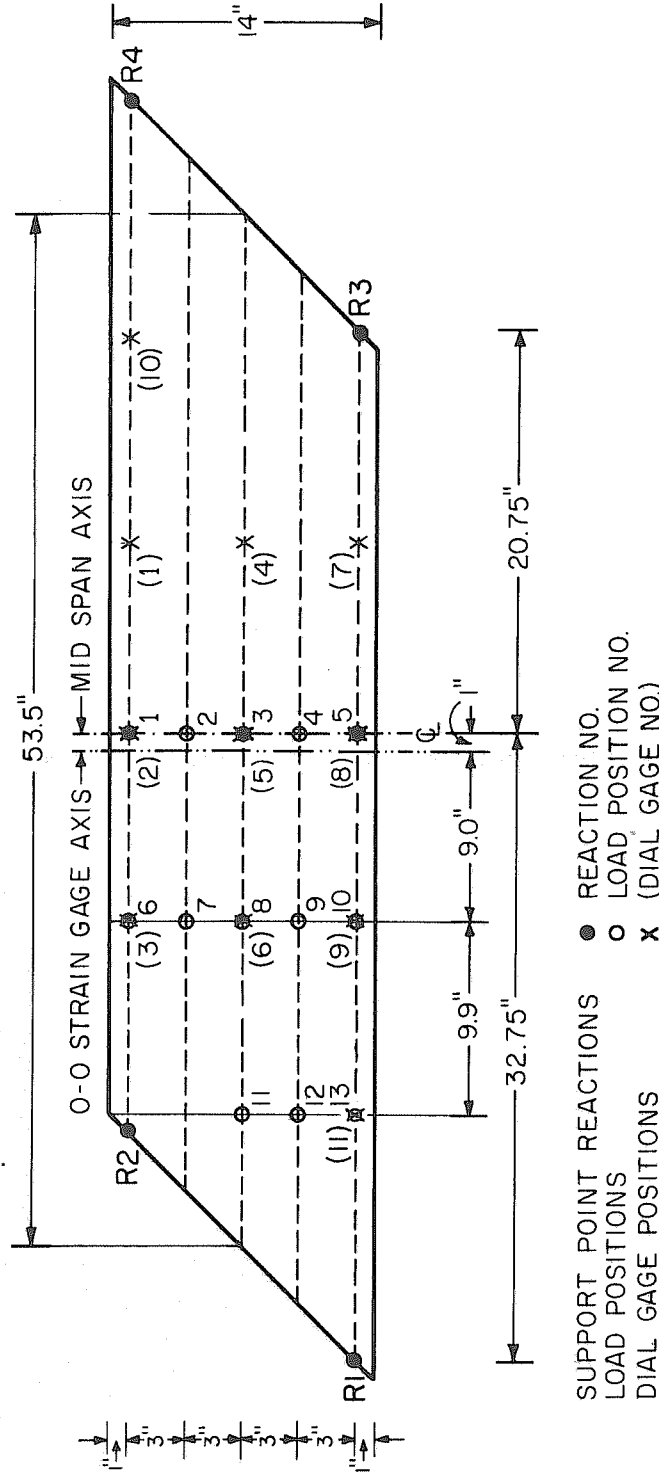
SKEW BOX GIRDER BRIDGE MODEL NO. 1,
